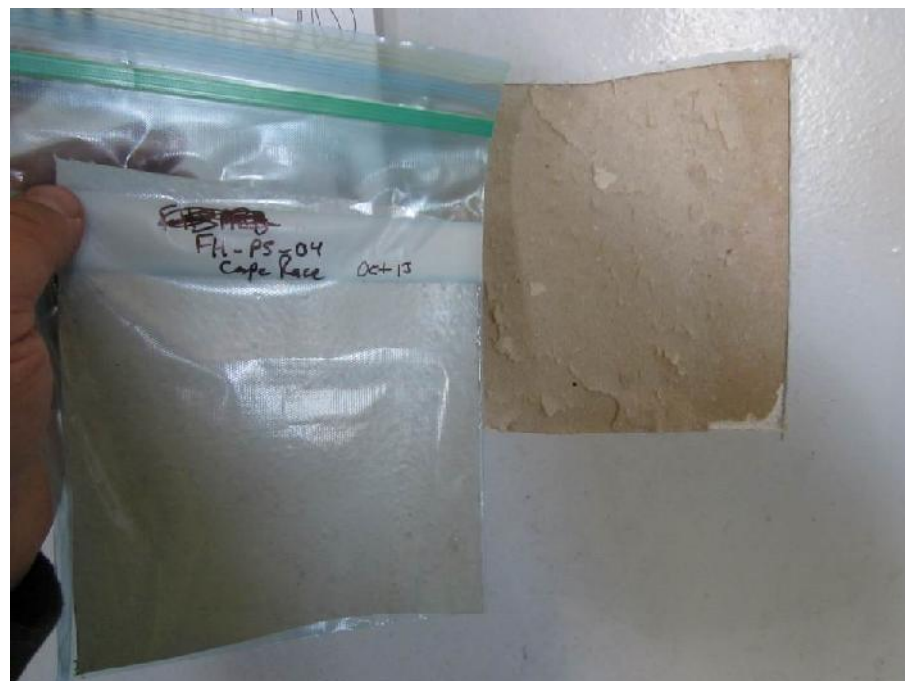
View of location of paint sample FH-PS-04 (interior wall).
